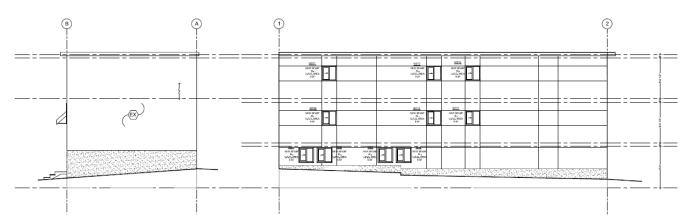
Building elevations of west (left image) and front north (right image) side of building, following the renovations.
